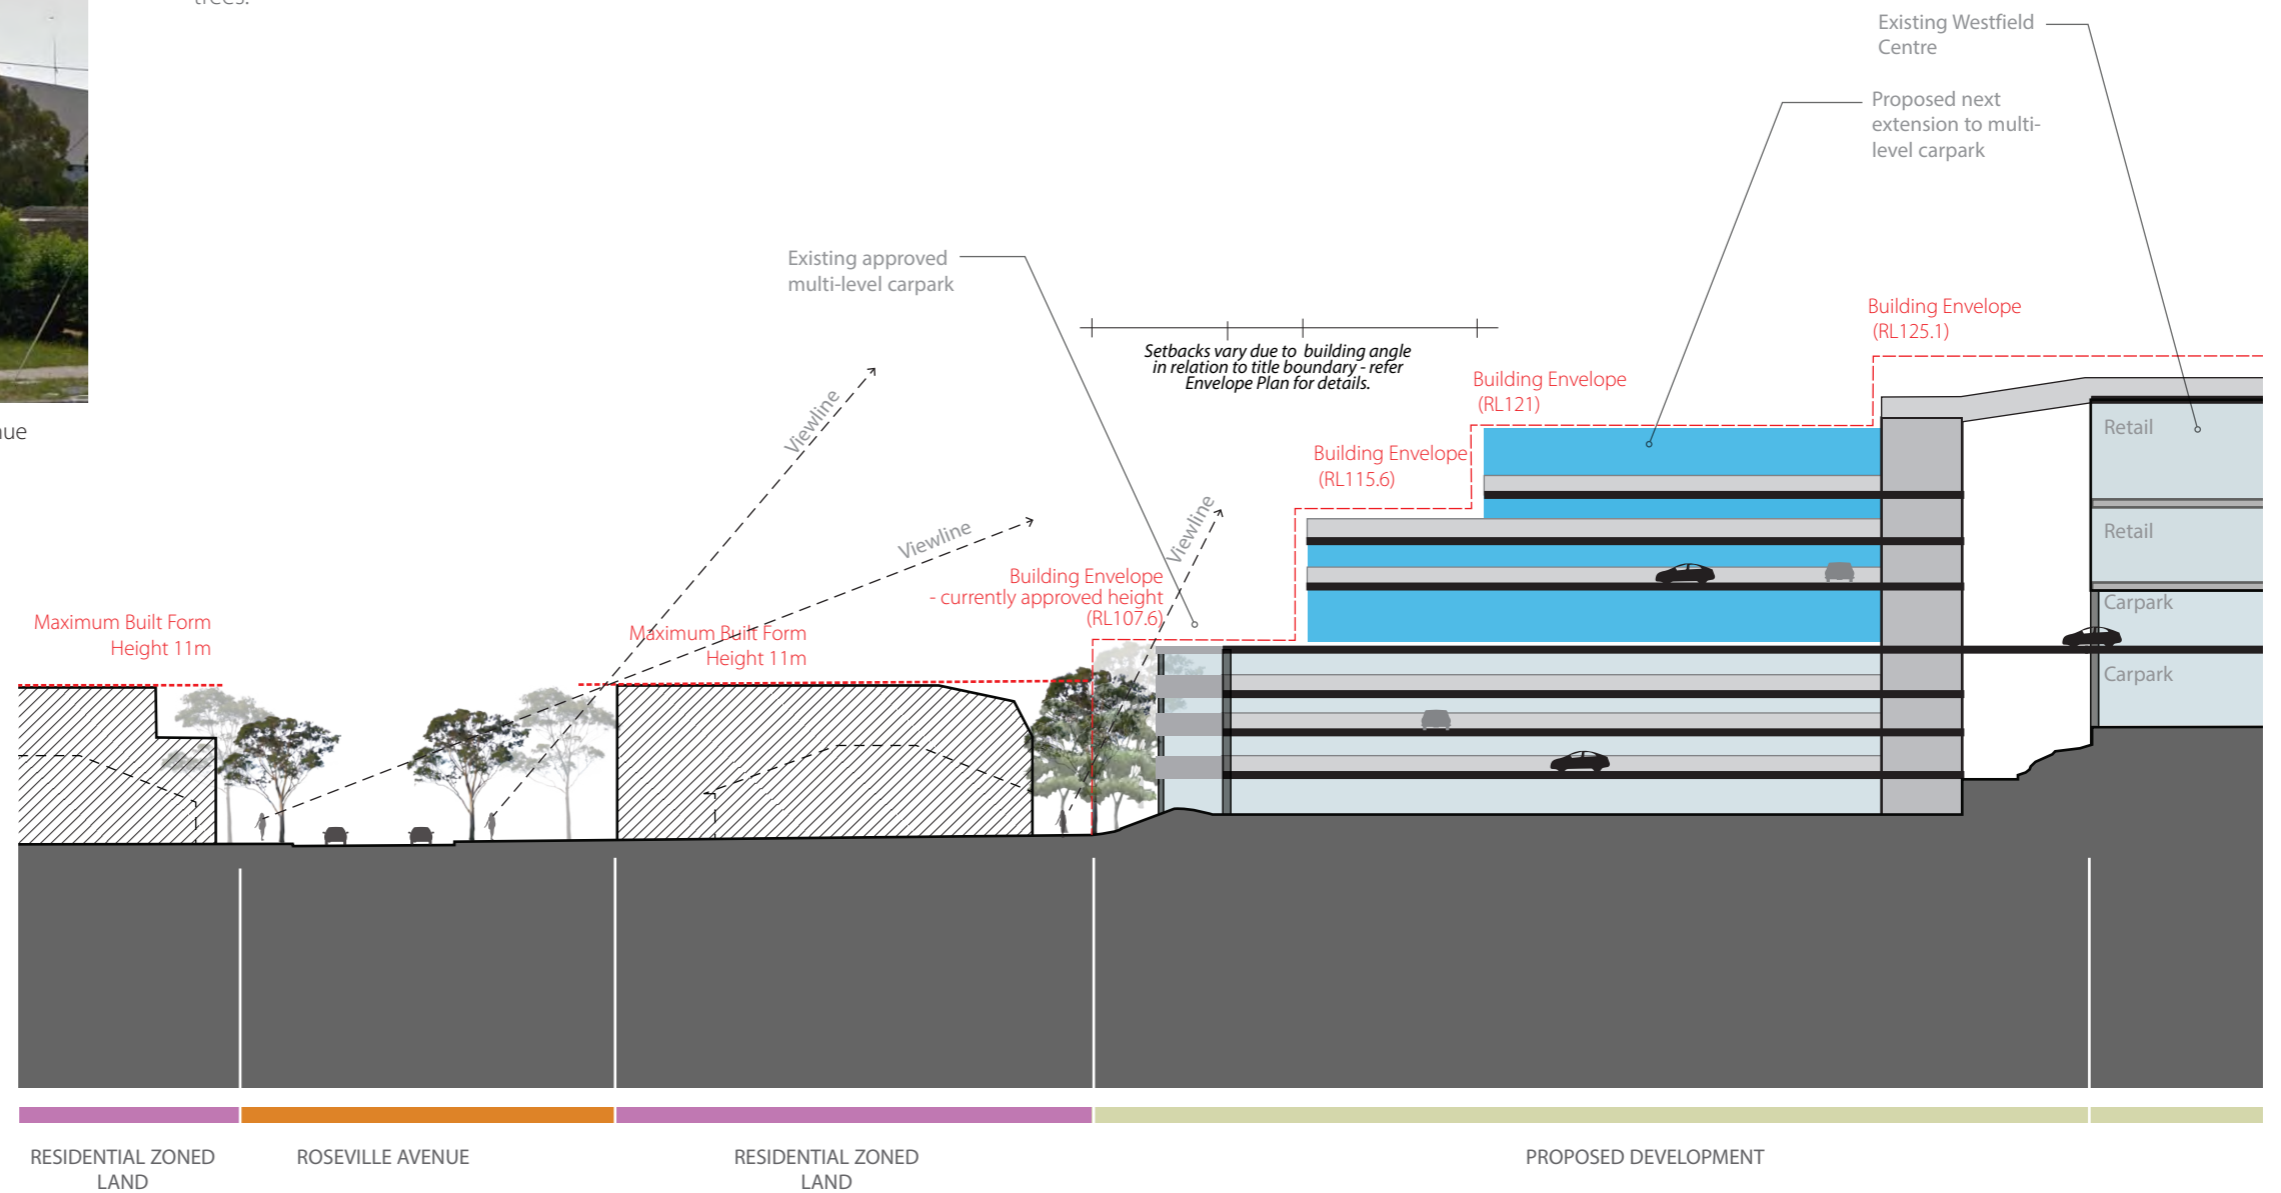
Typical section through Roseville Avenue showing built form envelope and potential expression of car parking structure (Floor levels are indicative only)
